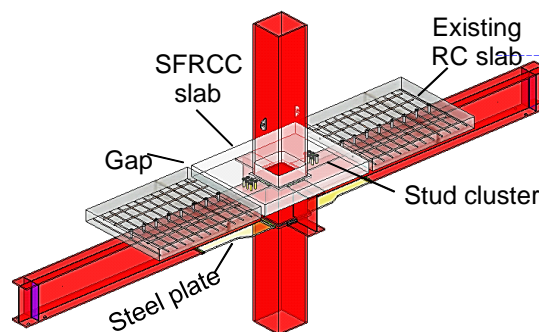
Proposed repair method to damaged beam-to-column connection
